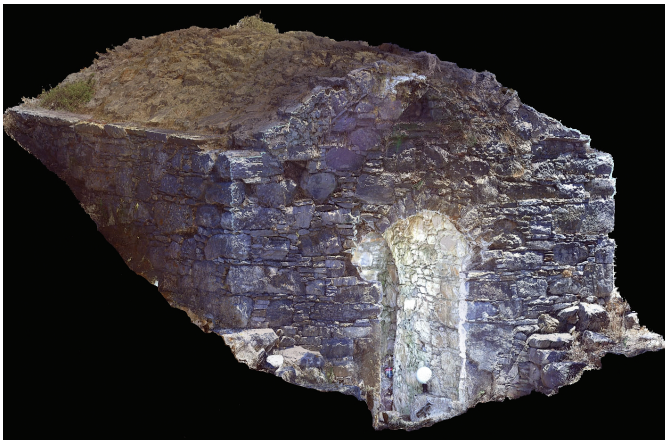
Image based on 3D data collected using terrestrial laser scanning which shows the north and west external elevations and a profile of the ground level immediately outside the church. Note projecting stubs of earlier masonry on both the south and north sides of the building's west elevation. (Image: Sam Turner and Alex Turner).
